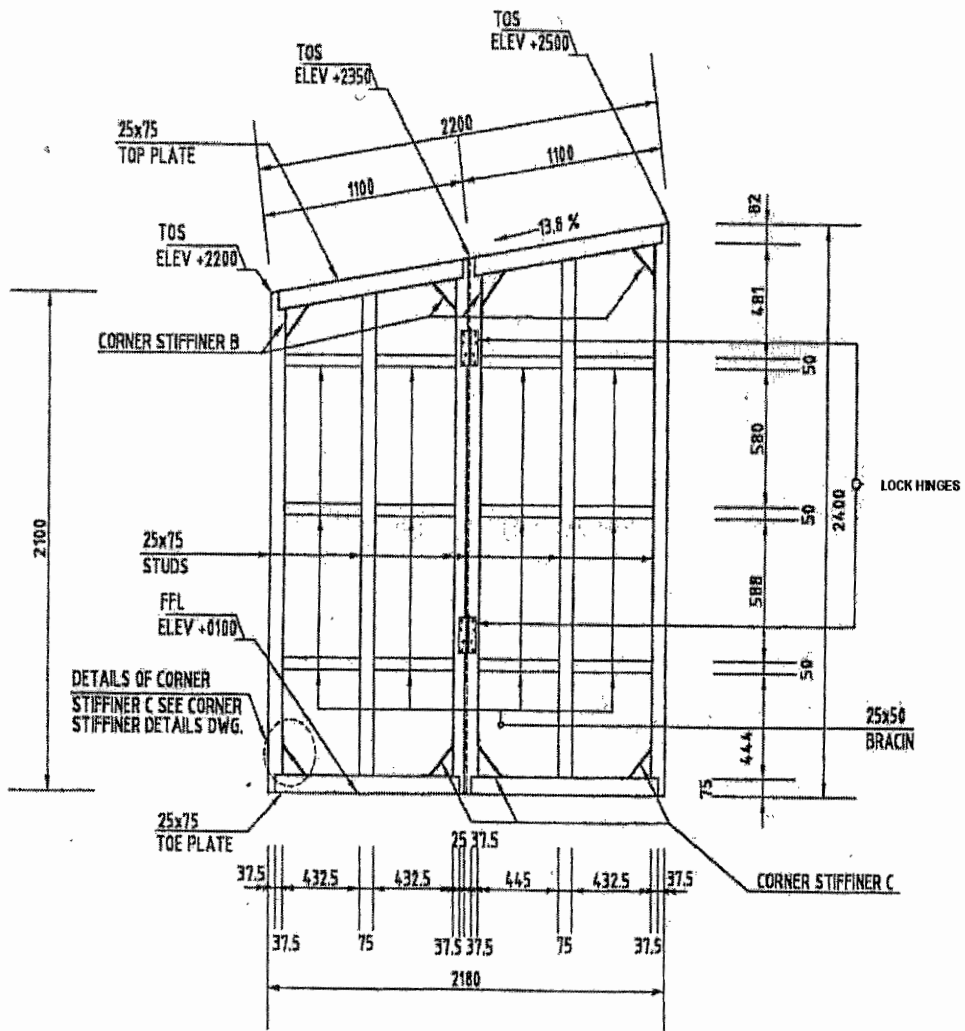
Geometry of the timber frame (dimensions are mm).
